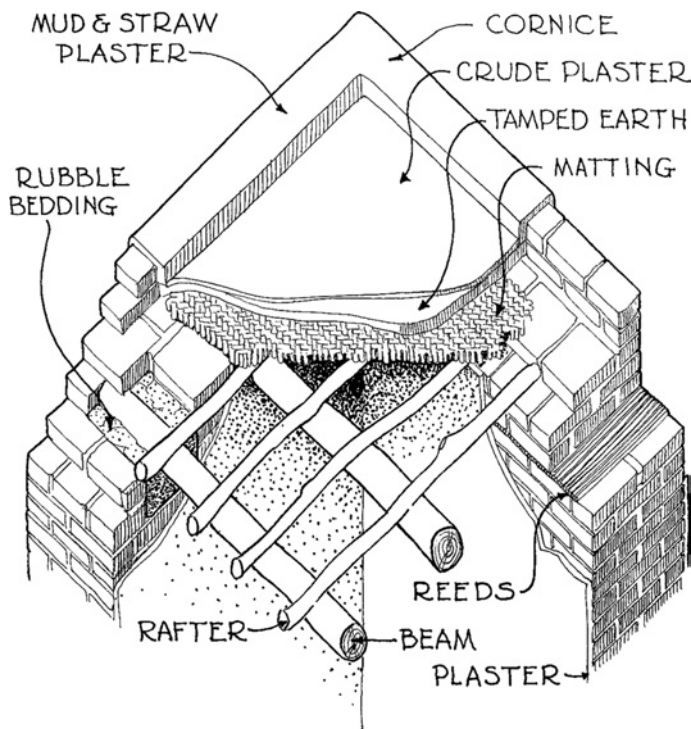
Schematic diagram of Durene roof construction, from an archive drawing.
